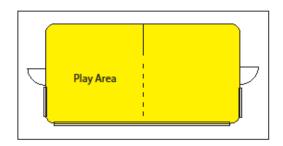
Brenner's 8th floor Play Room Plan. Not to scale.
